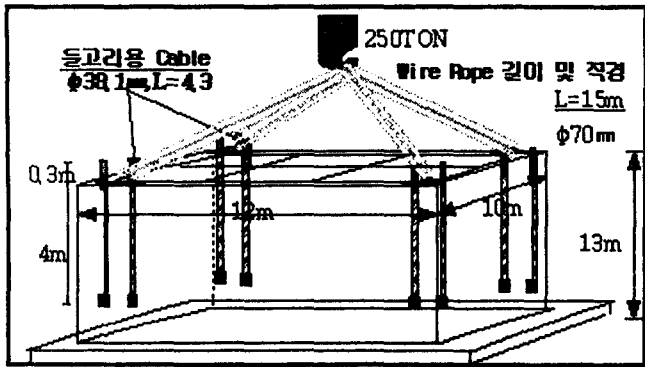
Shear force and drawing of wire rope length and layout plan of caisson lifting
